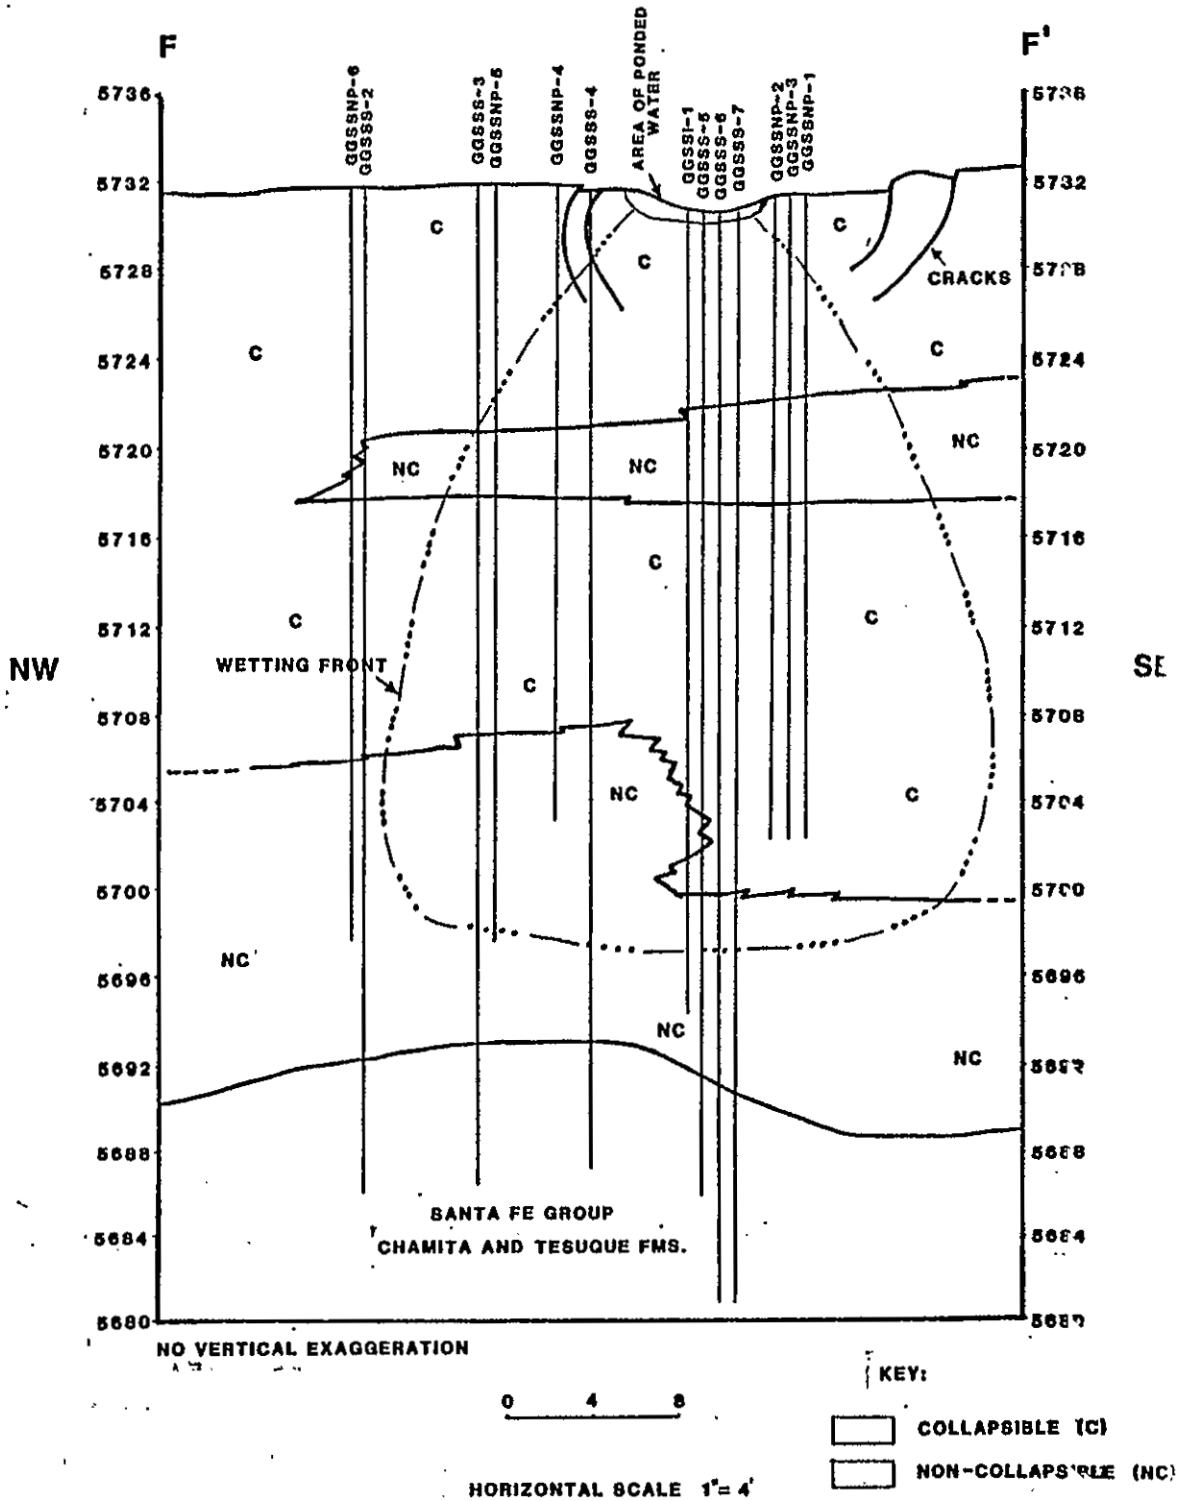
E: CROSS-SECTION FF' SHOWING COLLAPSIBLE AND NON-COLLAPSIBLE ZONES THROUGH GGSS AREA 1 BASED ON PLATES 7A-7D.
